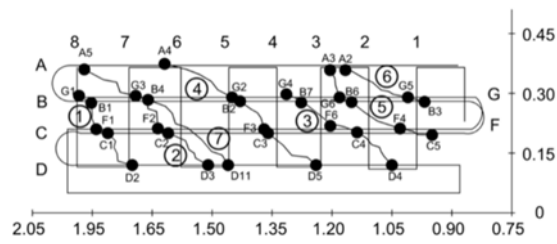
Shear crack pattern of beam I-1 at 262 kN.
